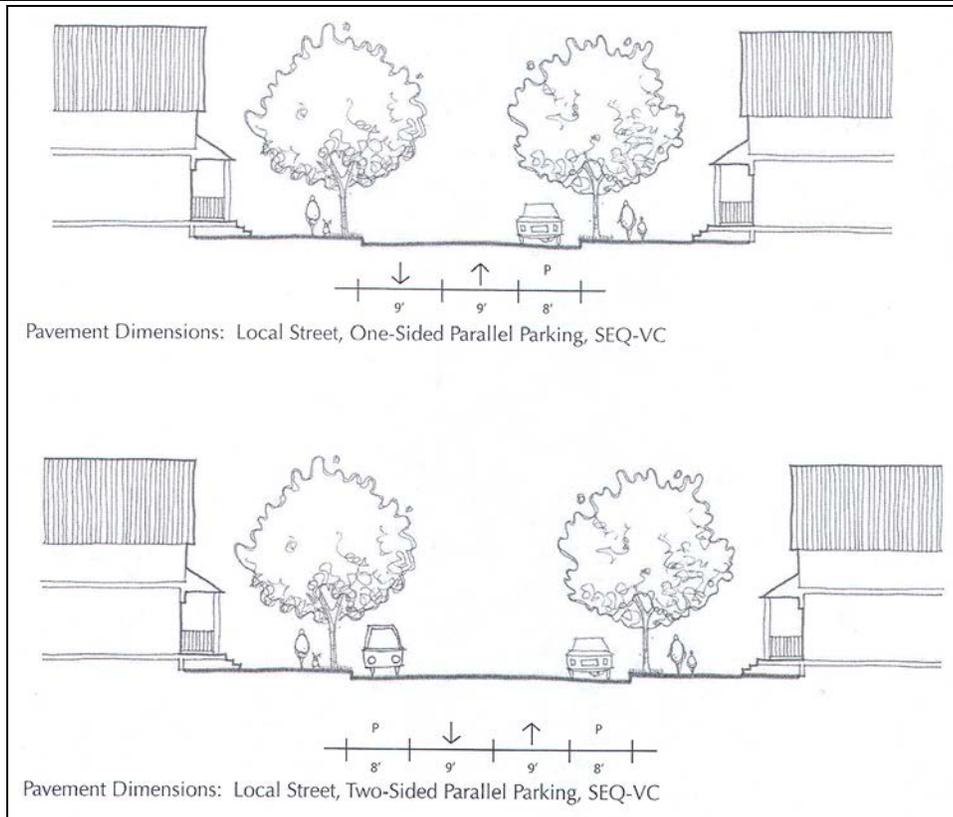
Pavement Dimensions: Local Streets, SEQ-VC
